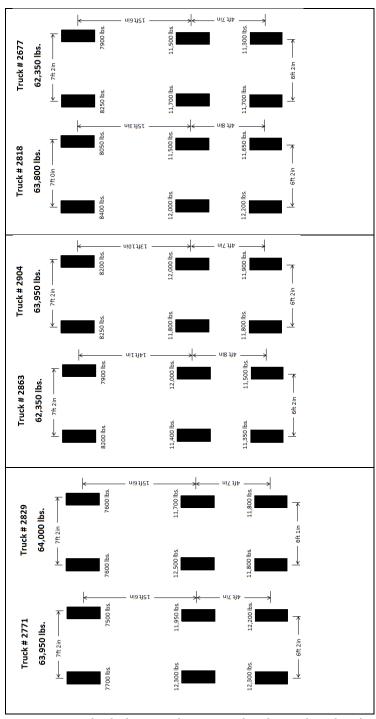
Vehicle layout showing wheel weights: load test 4
